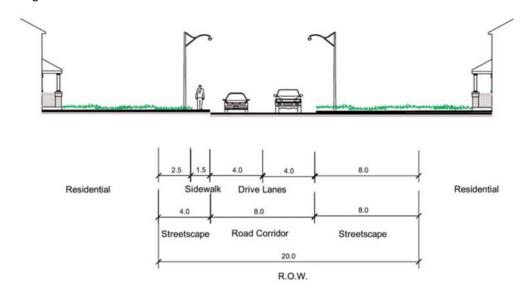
THE QUEENSWAY, KSP EXISTING CROSS-SECTION (NORTH OF MORTON AVENUE)
